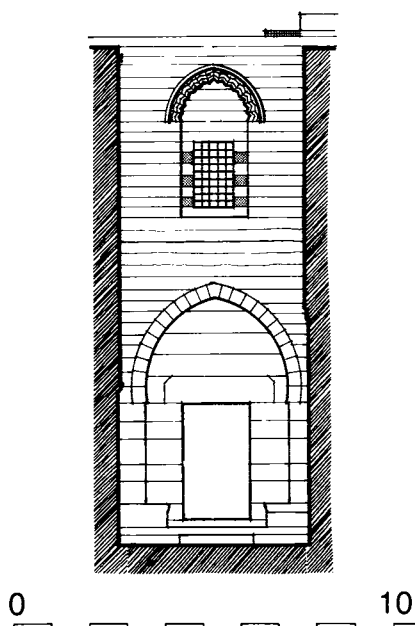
Bāb al-Ḥadīd: Street elevation
